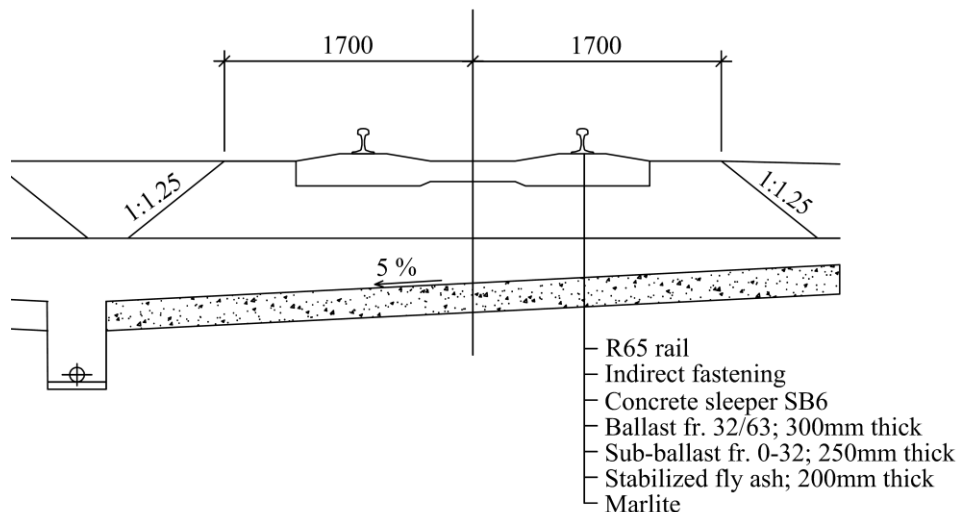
Cross-sectional view of the test section with protective layer of stabilized fly ash
